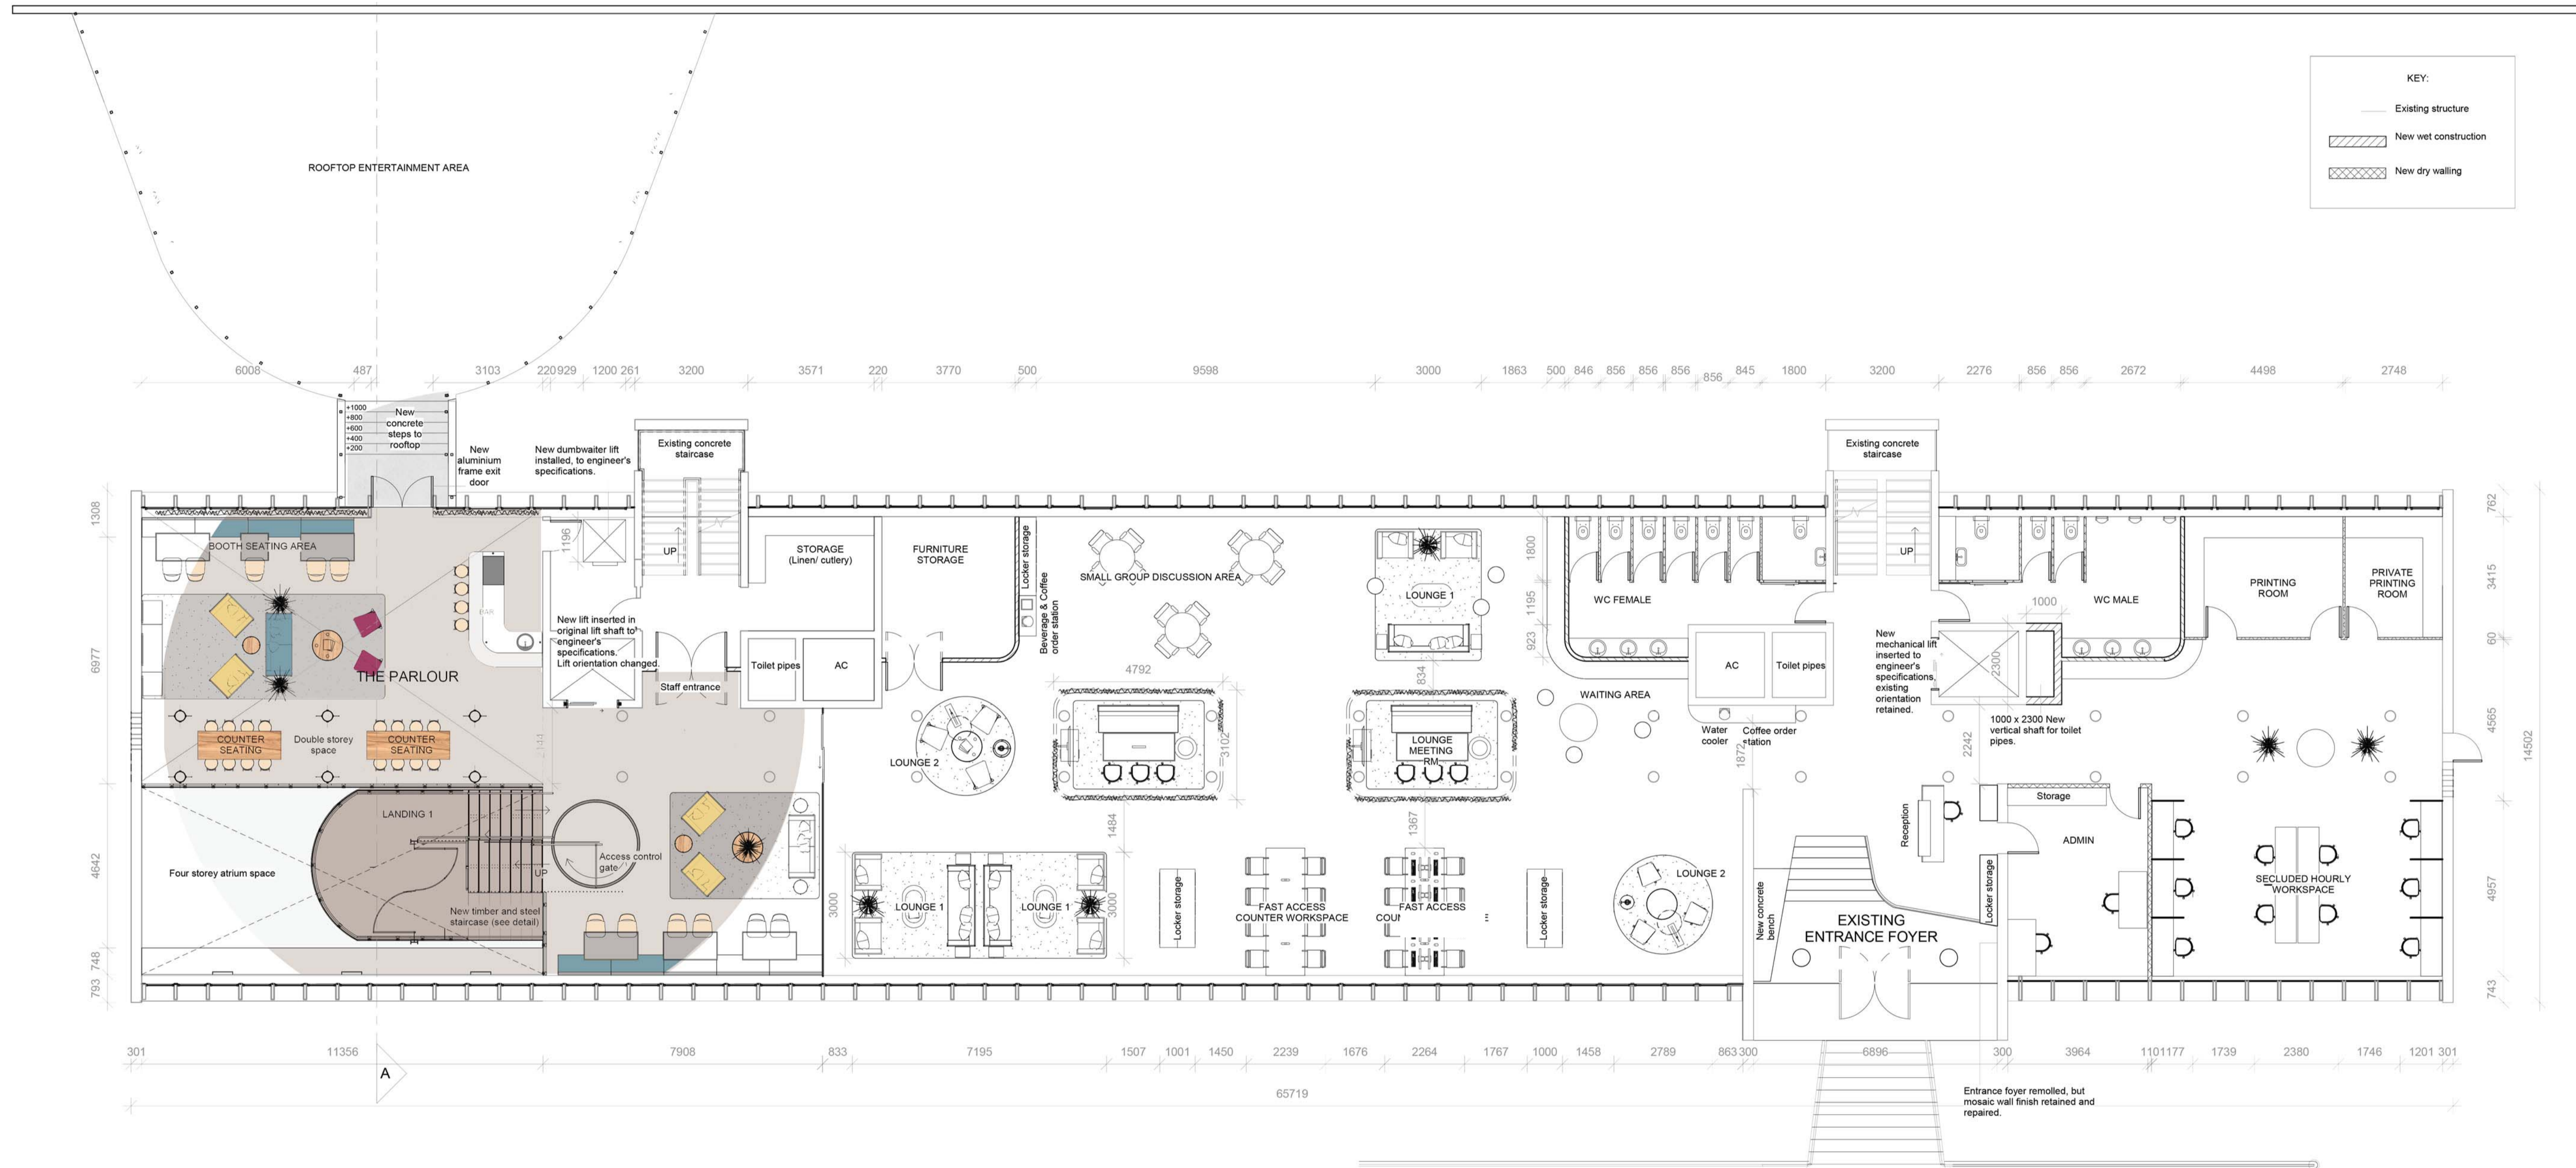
UPPER GROUND FLOOR PLAN SCALE 1:100
